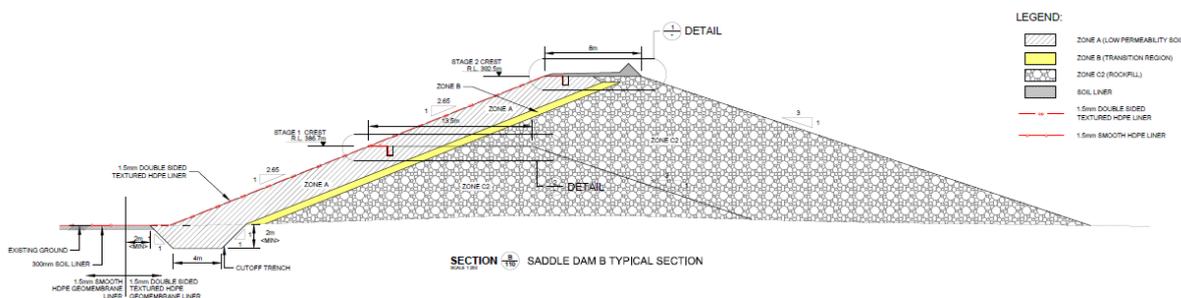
and Figure 18.3.4 show the typical details of the TSF embankment and saddle dam.
